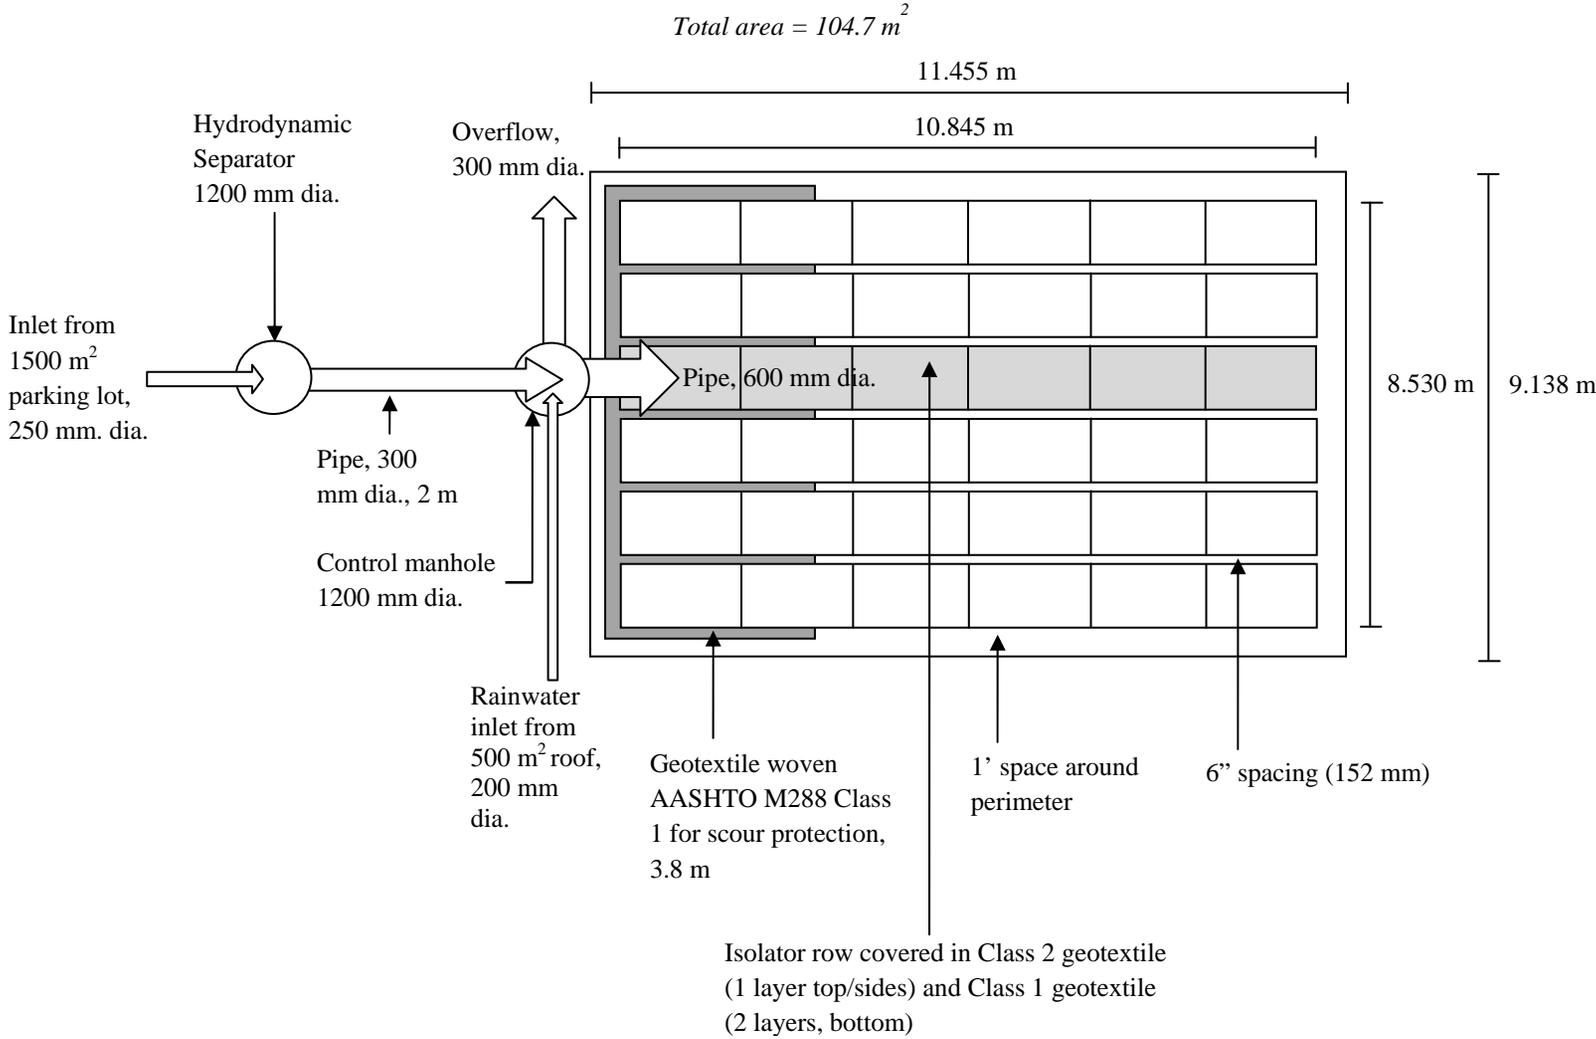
Plan view for infiltration chambers receiving road (1500 m²) and roof runoff (500 m²)
